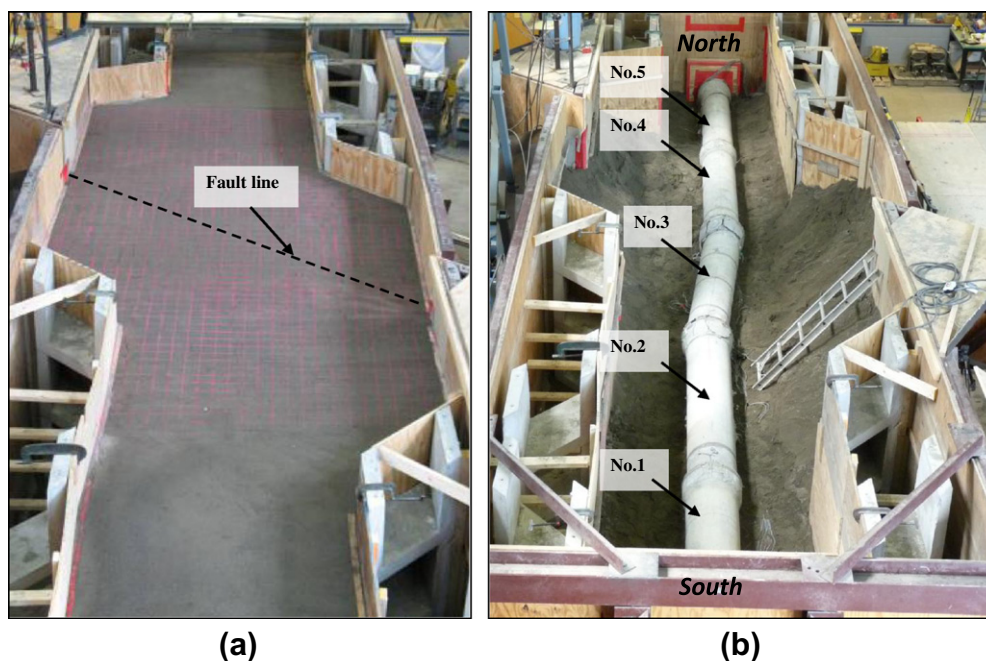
(a) Test basin after backfilling, (b) full-scale segmental concrete pipeline (after excavation) tested at the large-scale testing facility at the George E. Brown, Jr. Network for Earthquake Engineering Simulation (NEES) site at Cornell University.
